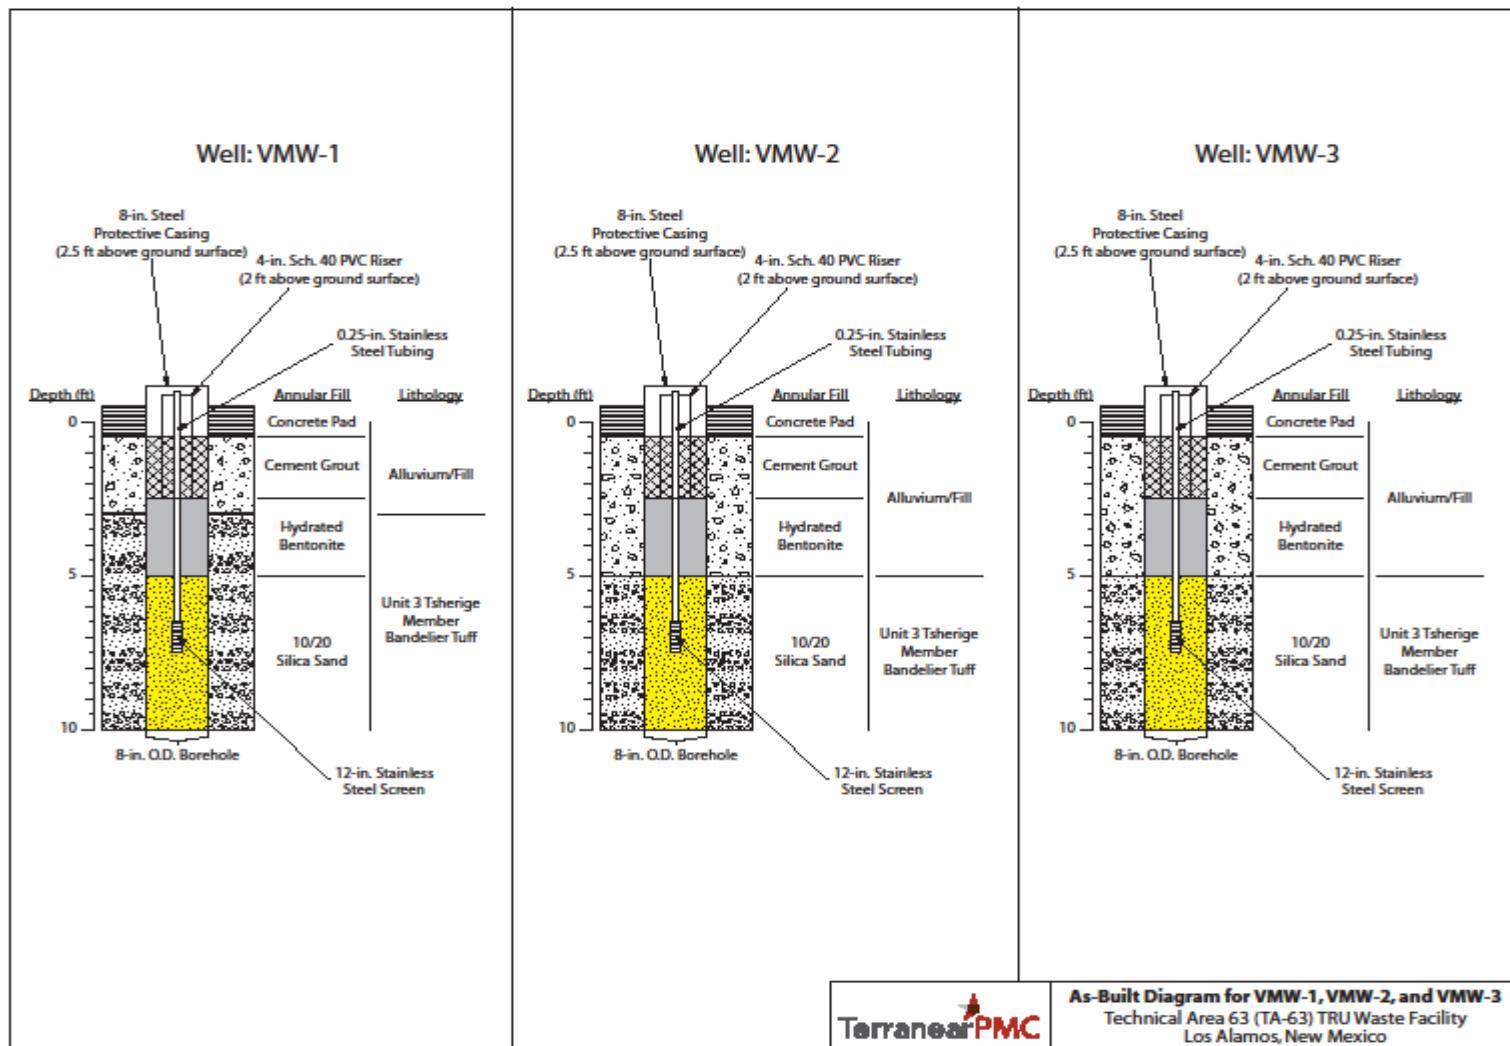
VMW-1, VMW-2 and VMW-3 Well Construction and Lithologic Details.
